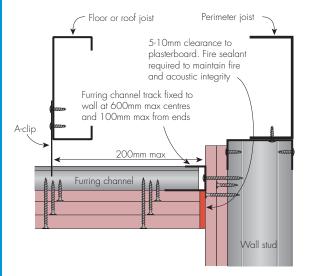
Fire Rated Ceiling to Wall Direct fixed to joist
